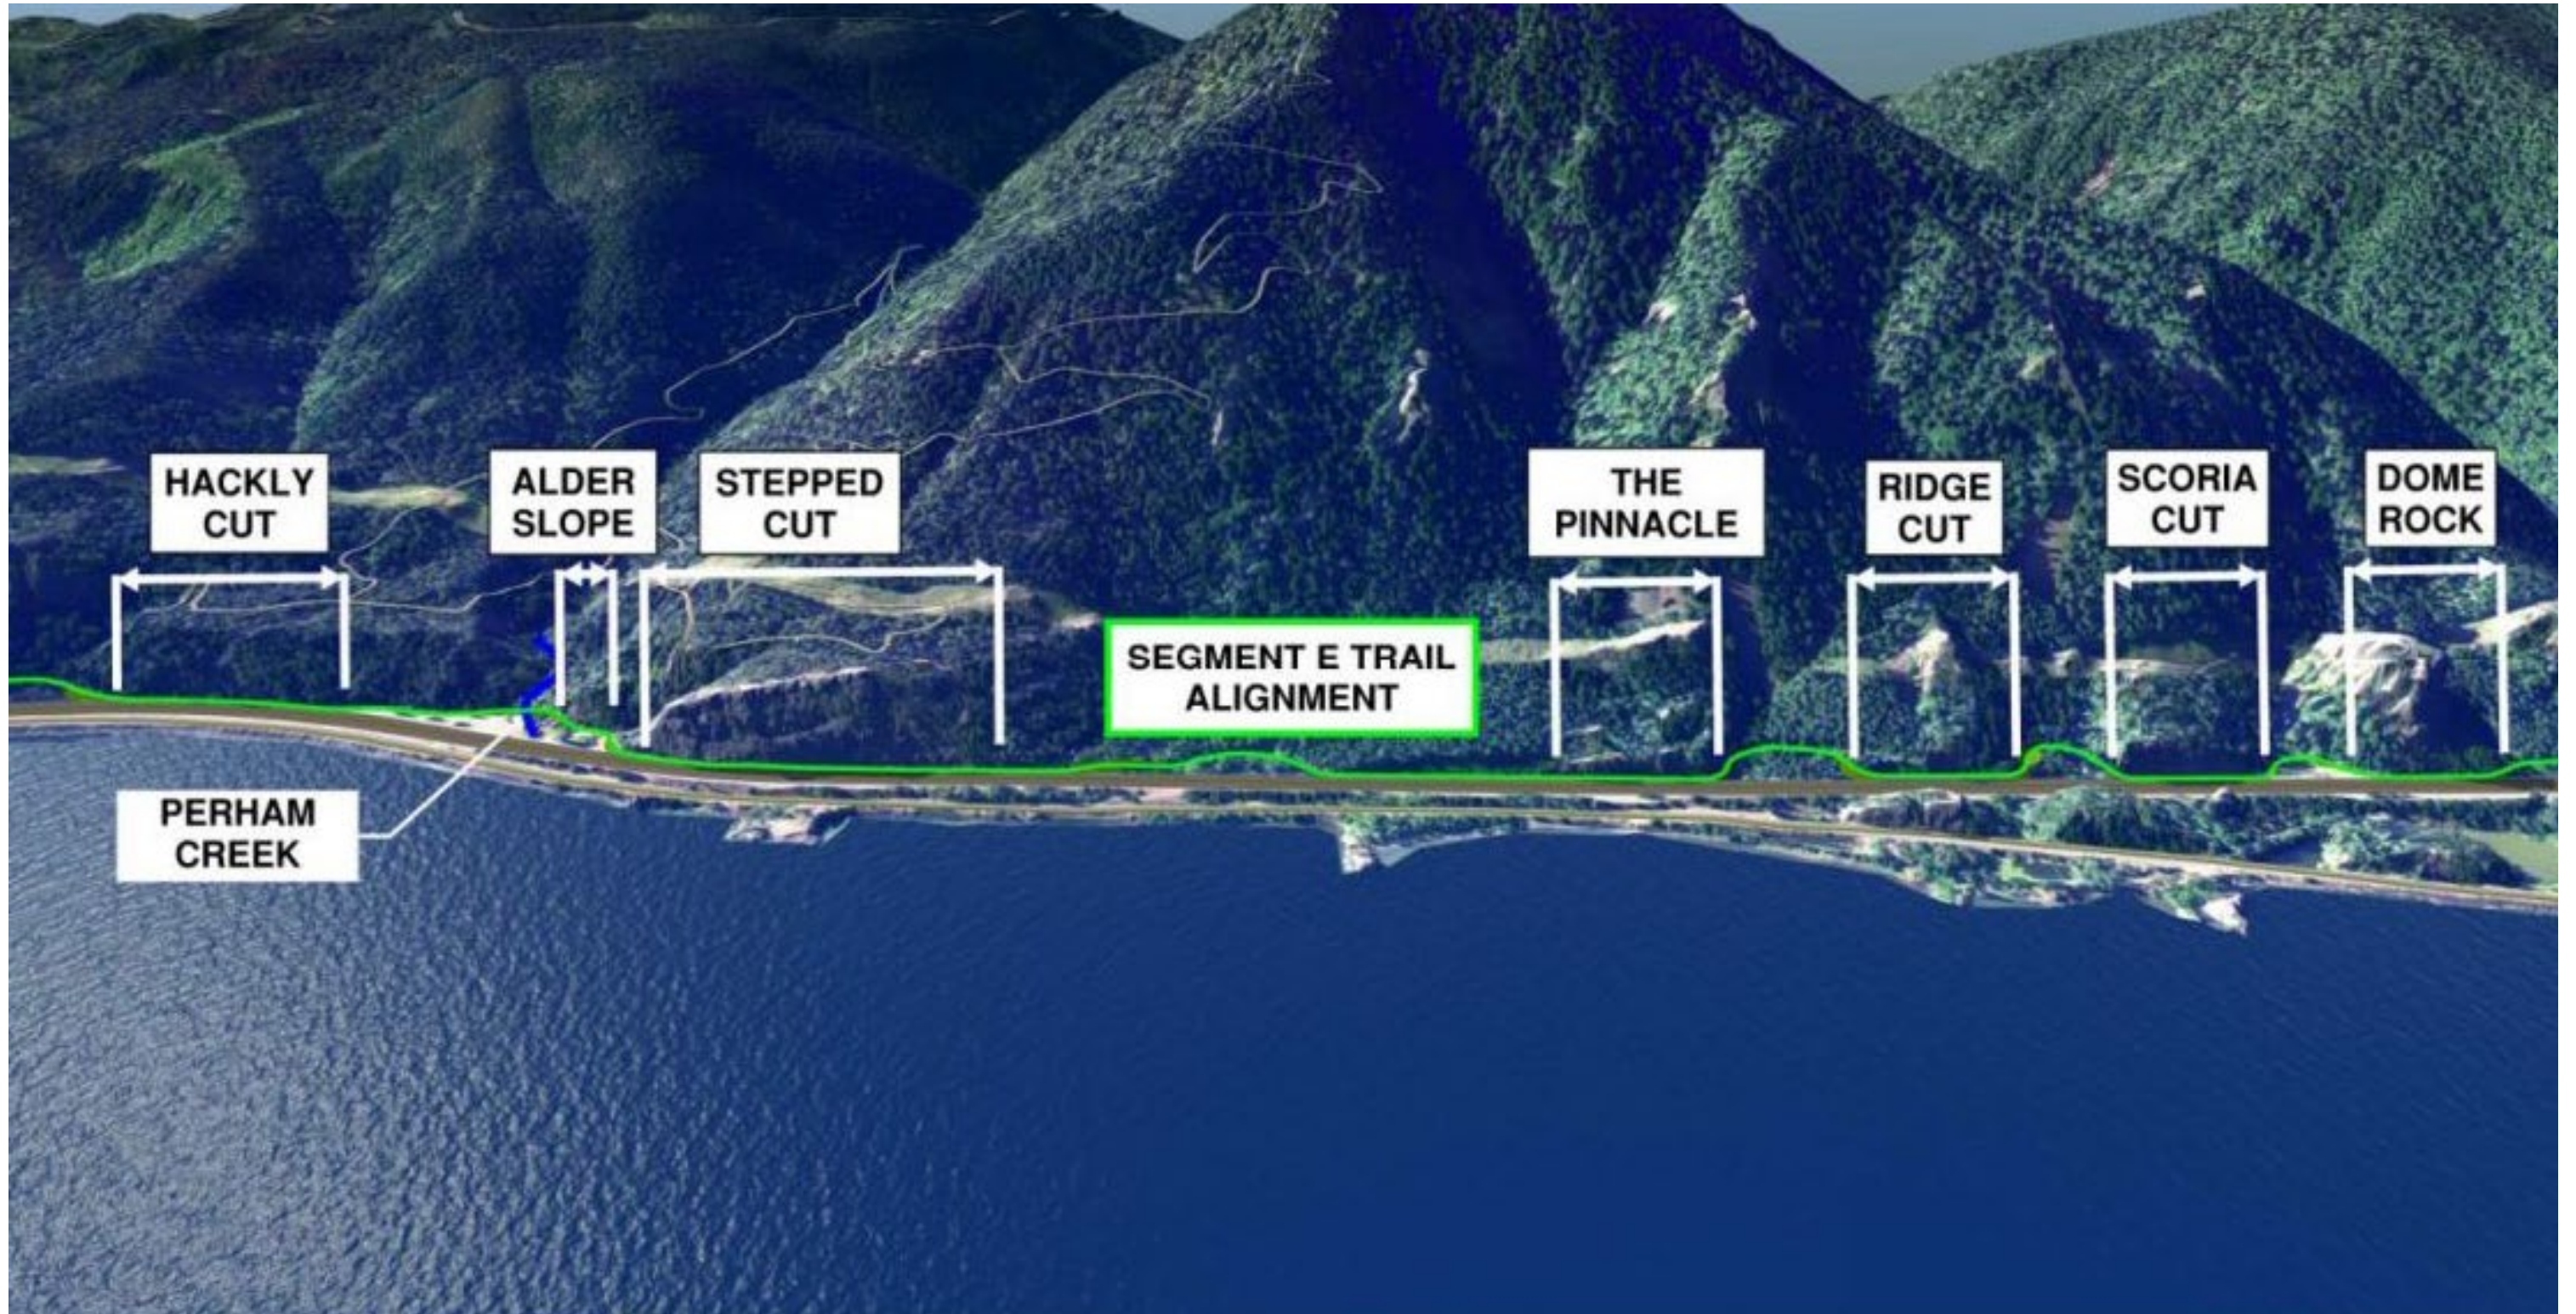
Rock Faces Adjacent to I-84 along the Proposed Trail Segment E
